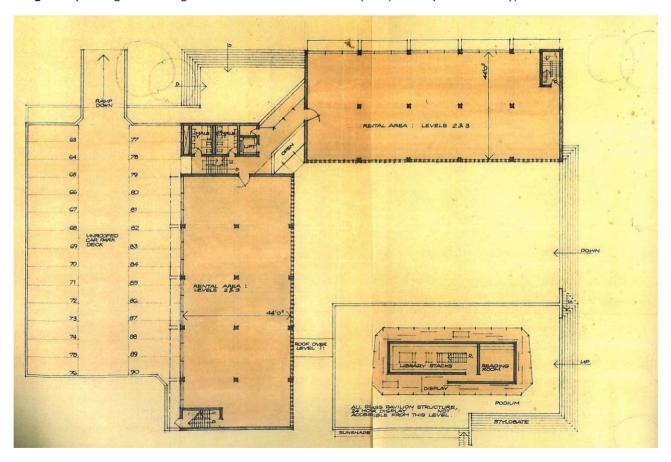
Boyd's original drawings of Churchill House – second floor plan (courtesy of Ann Cleary)
